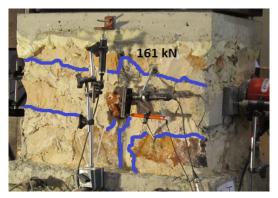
Crack pattern and Collapse of masonry specimens made with hydraulic mortar
